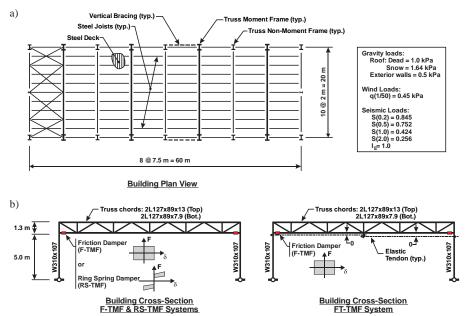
Building studied: a) Building plan view and design loads; b) Building cross-sections illustrating the F-TMF, RS-TMF and FT-TMF systems.
